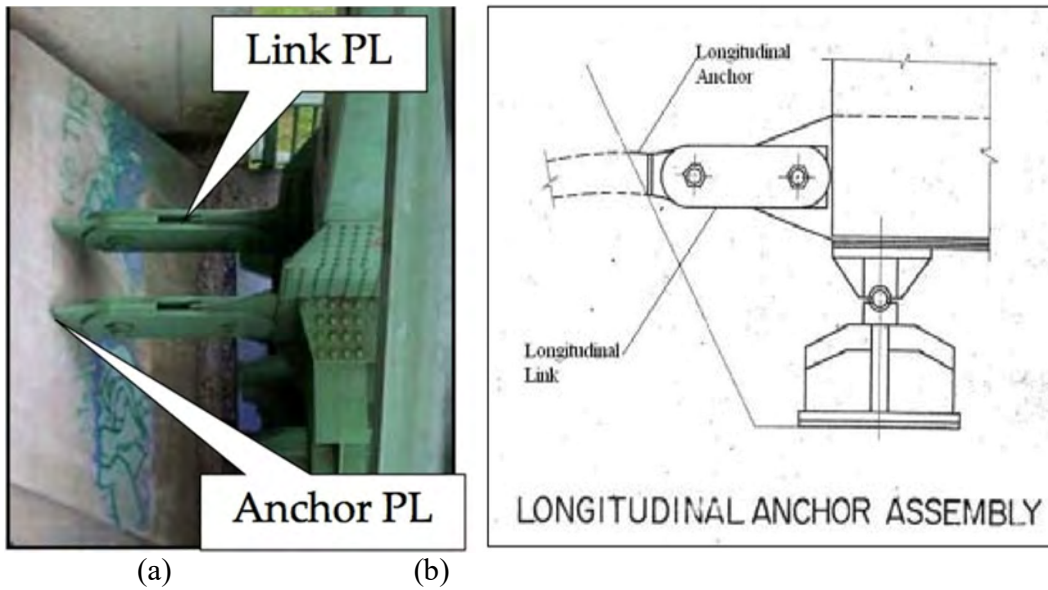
Longitudinal Anchors Assembly to the Abutment
